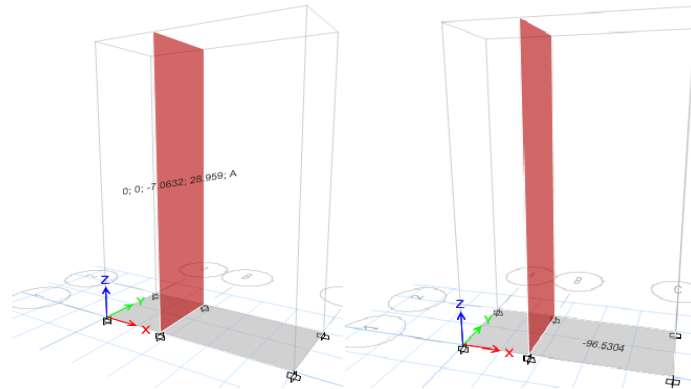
Model of retaining wall without shelf with load acting on its stem and heel portion.
